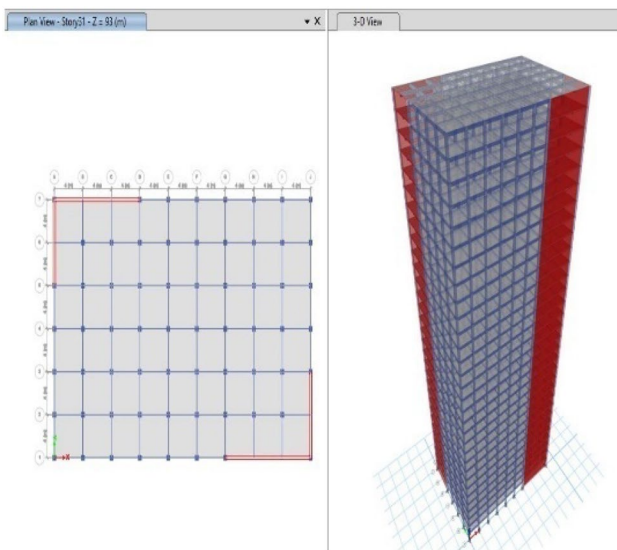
Model-4: Buildings with shear walls located at only two opposite corners
